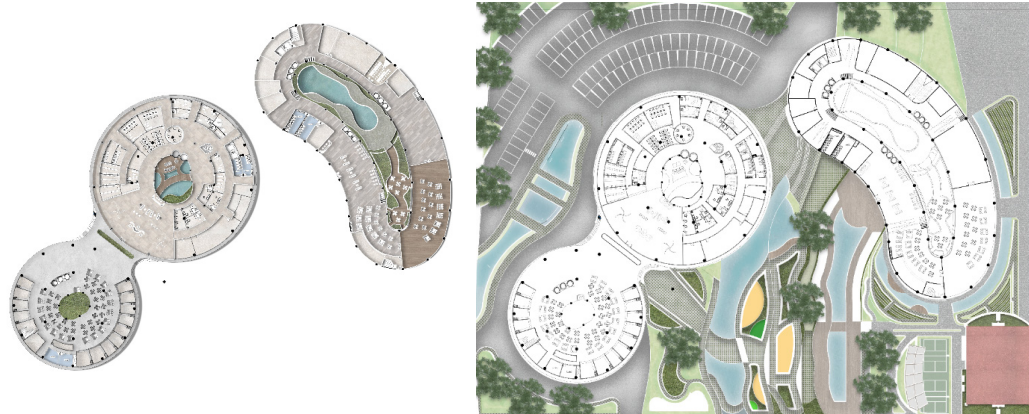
Site plan and 1st Floor Plan. (Source: Researcher, 2024)
